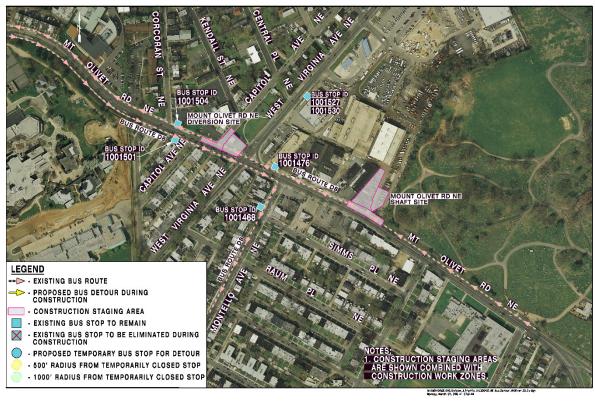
Study Area 1 - Existing Route D8 and Bus Stop Locations (Mt Olivet Road Site)
